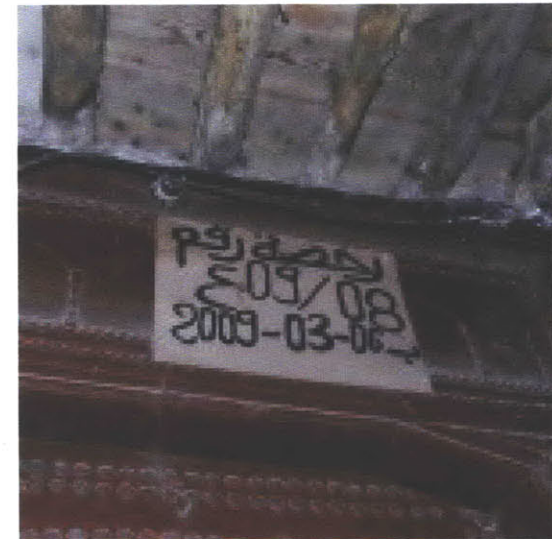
BUILDING CONSTRUCTION PERMISSION
